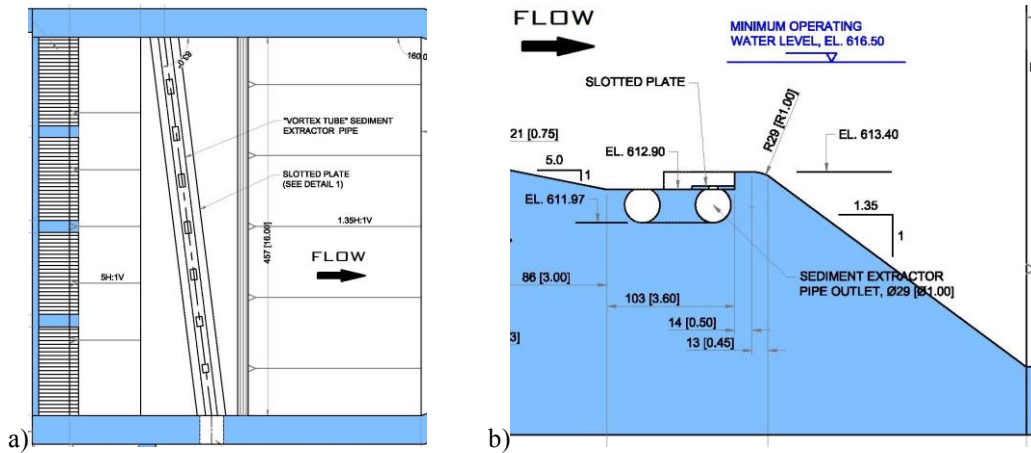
Recommended final design of the intake sediment extractor; a) plan and b) section views.
